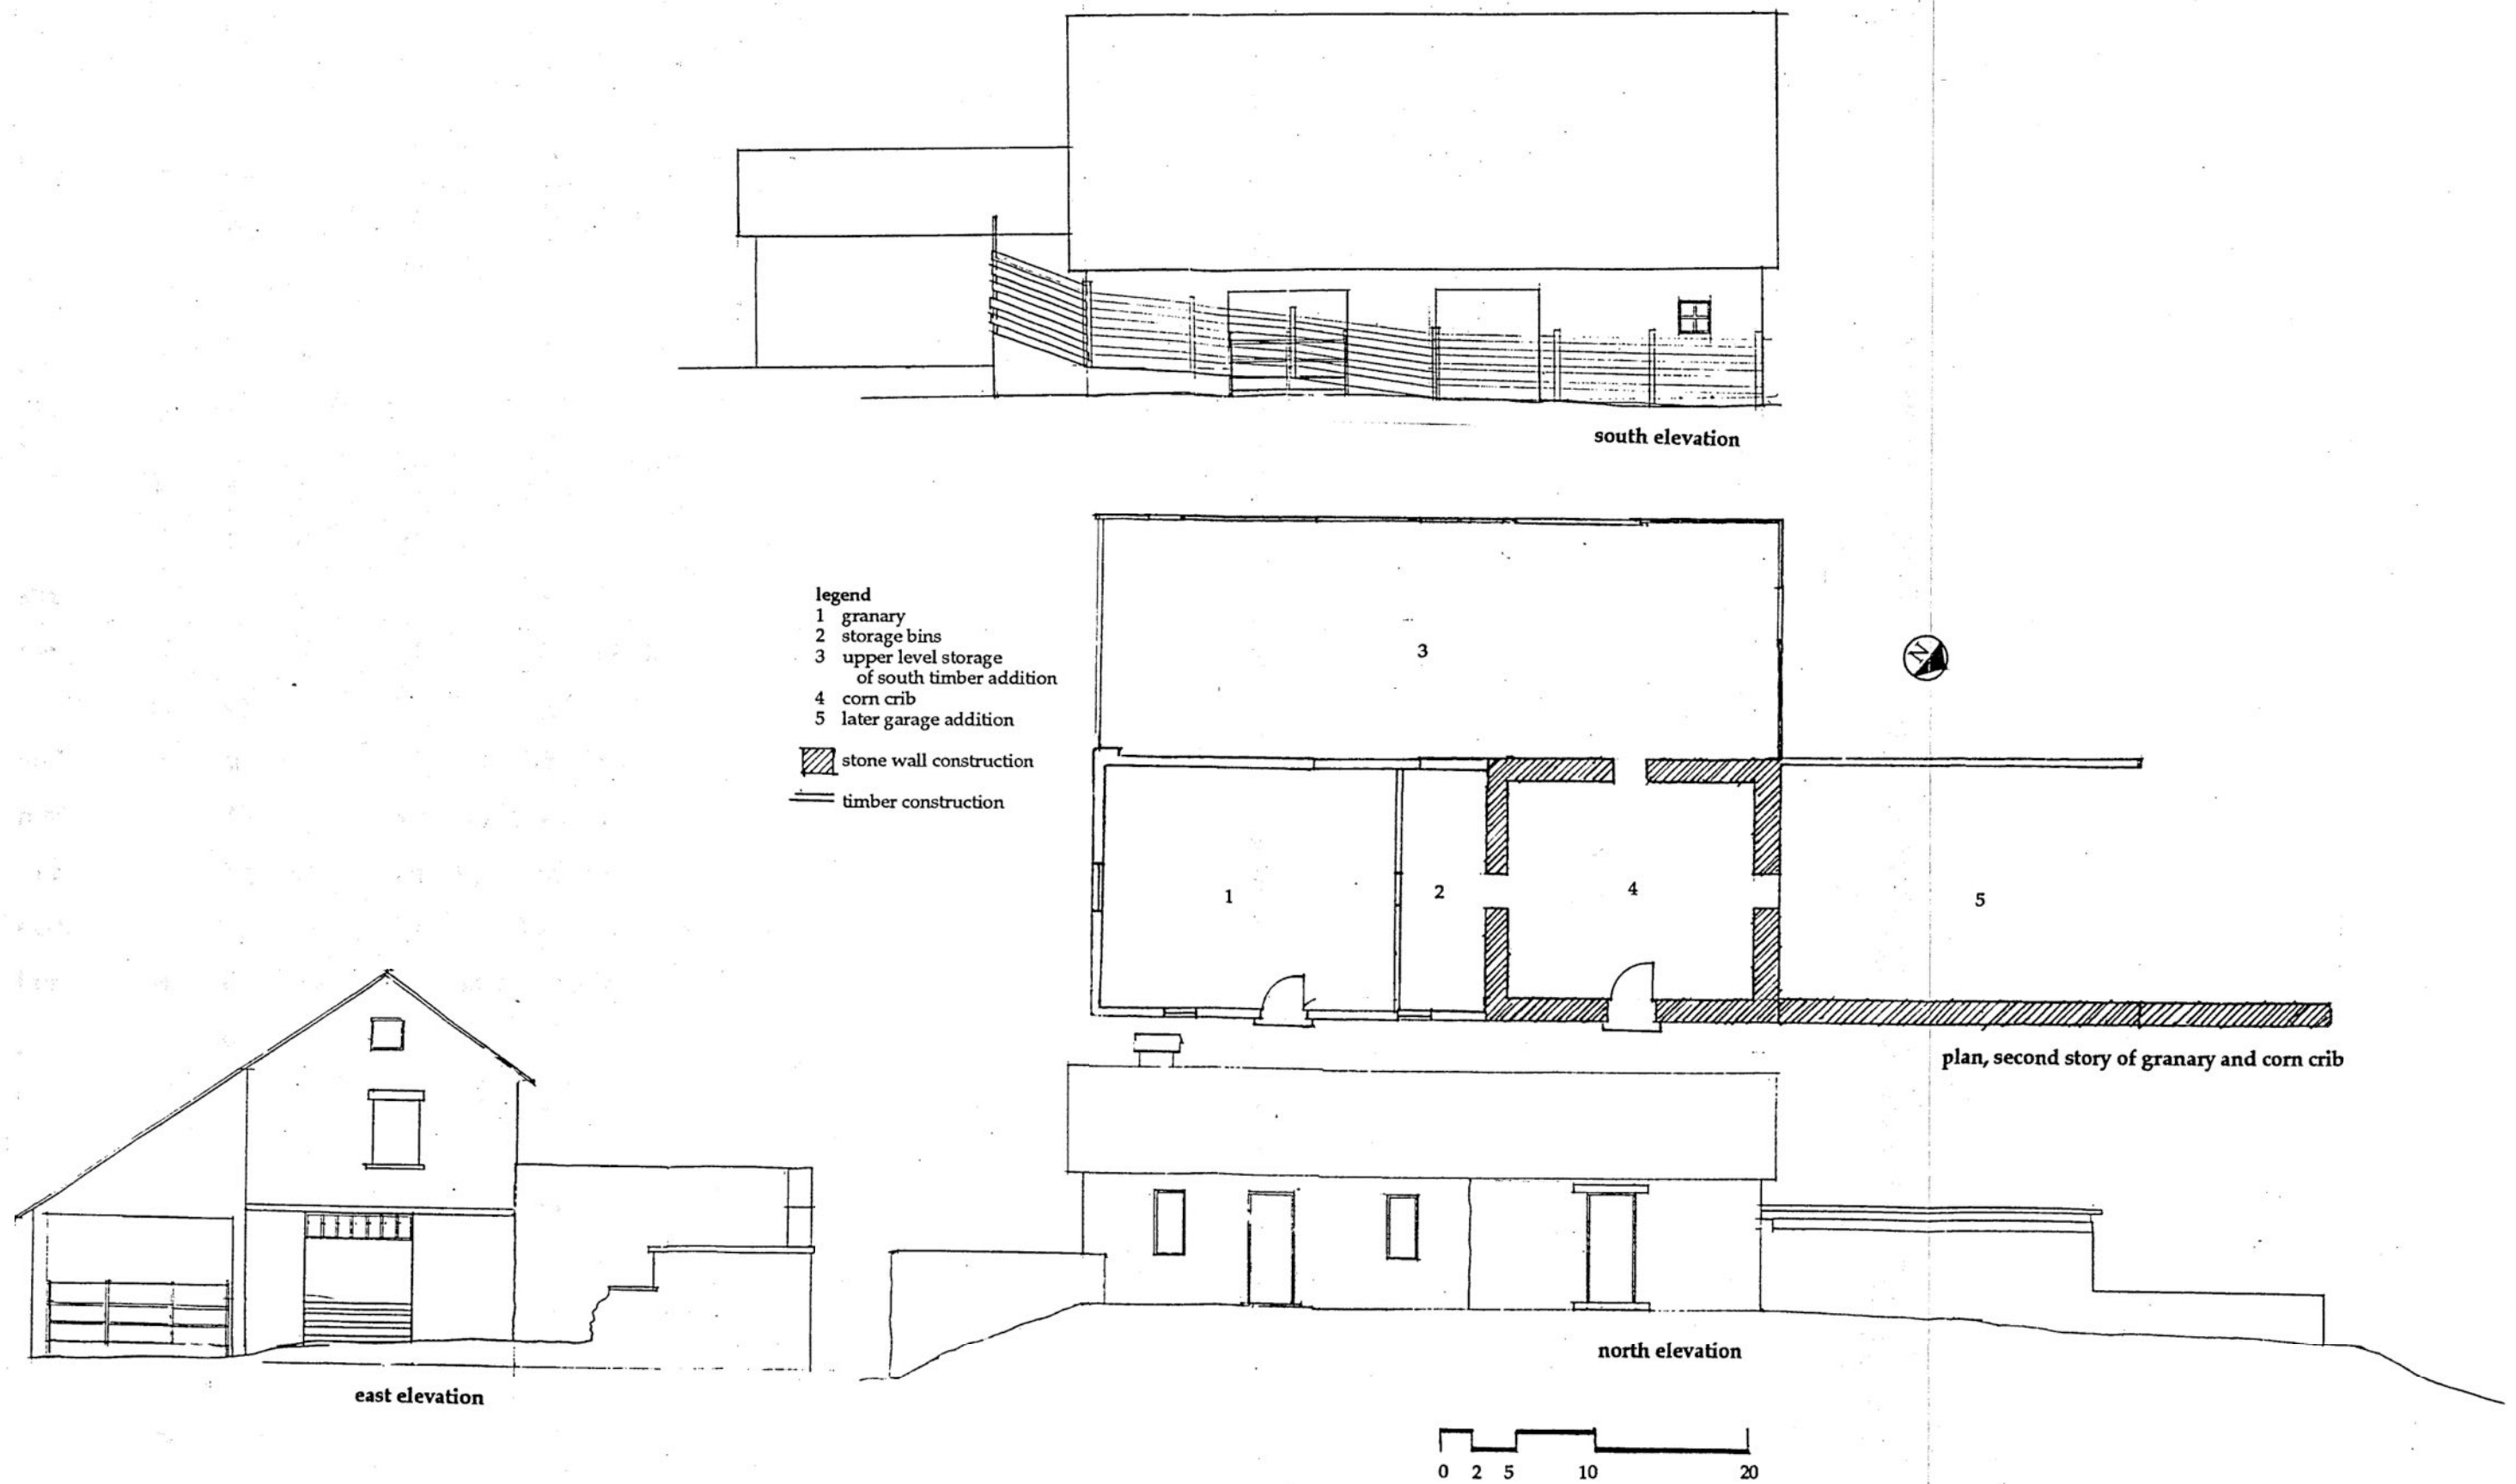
Elevations and plan, Henry Grimm granary and corncrib
